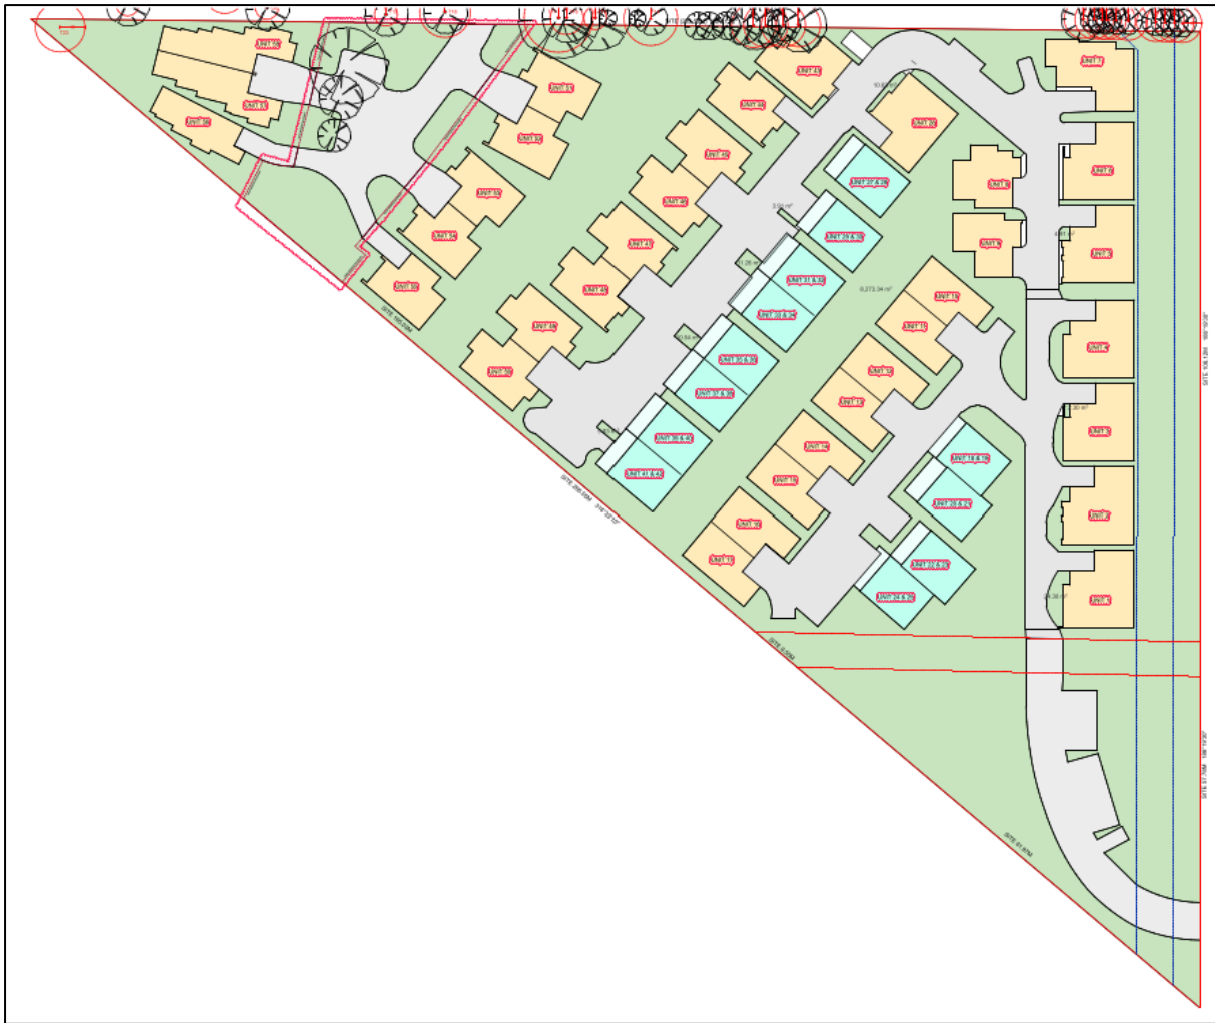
(above): Proposed layout plan showing 3-bedroom dwellings (pale yellow), 2-bedroom apartments (aqua blue), and vehicle accessways from Greenway Court (grey) at the north (top) and Basin Rise at the south east (bottom right). Source: Application documents.
